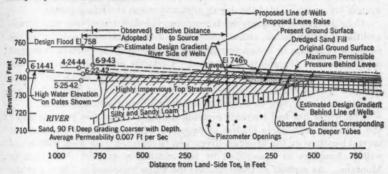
Section through Fairfax Levee at Kansas City, Kans., at Piezometer Installation
